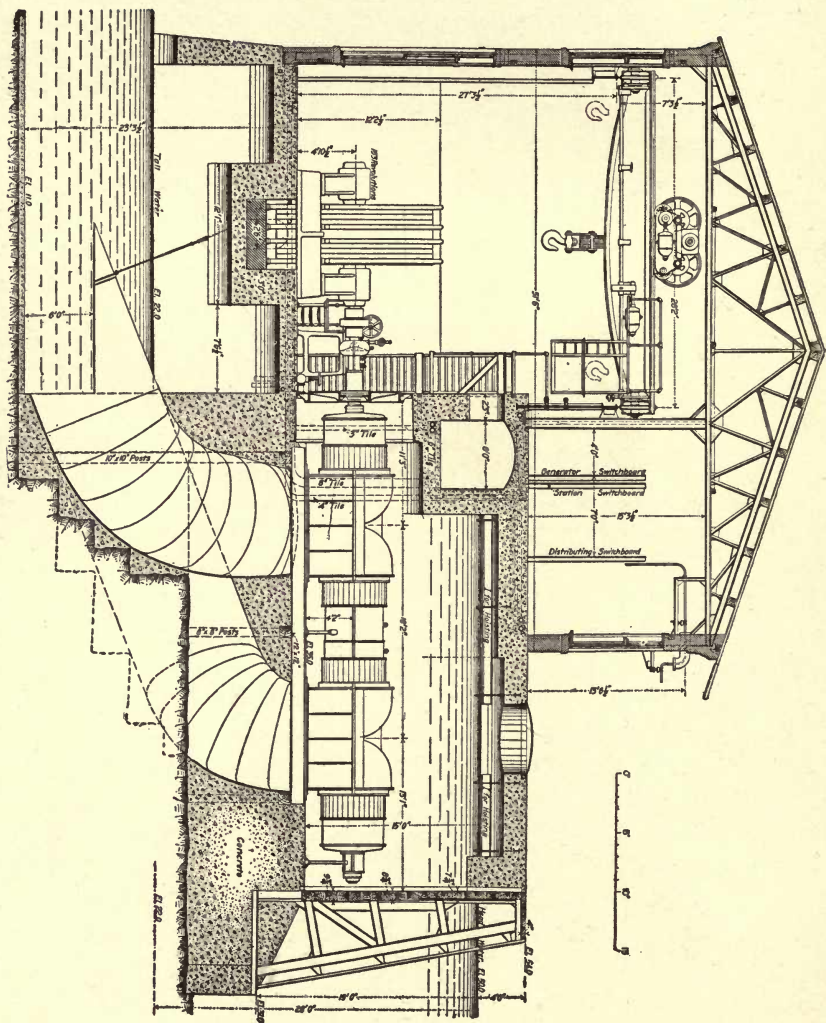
Cross-section of Power-house of the Montreal Light, Heat, and Power Co., at Chambly, Que.
